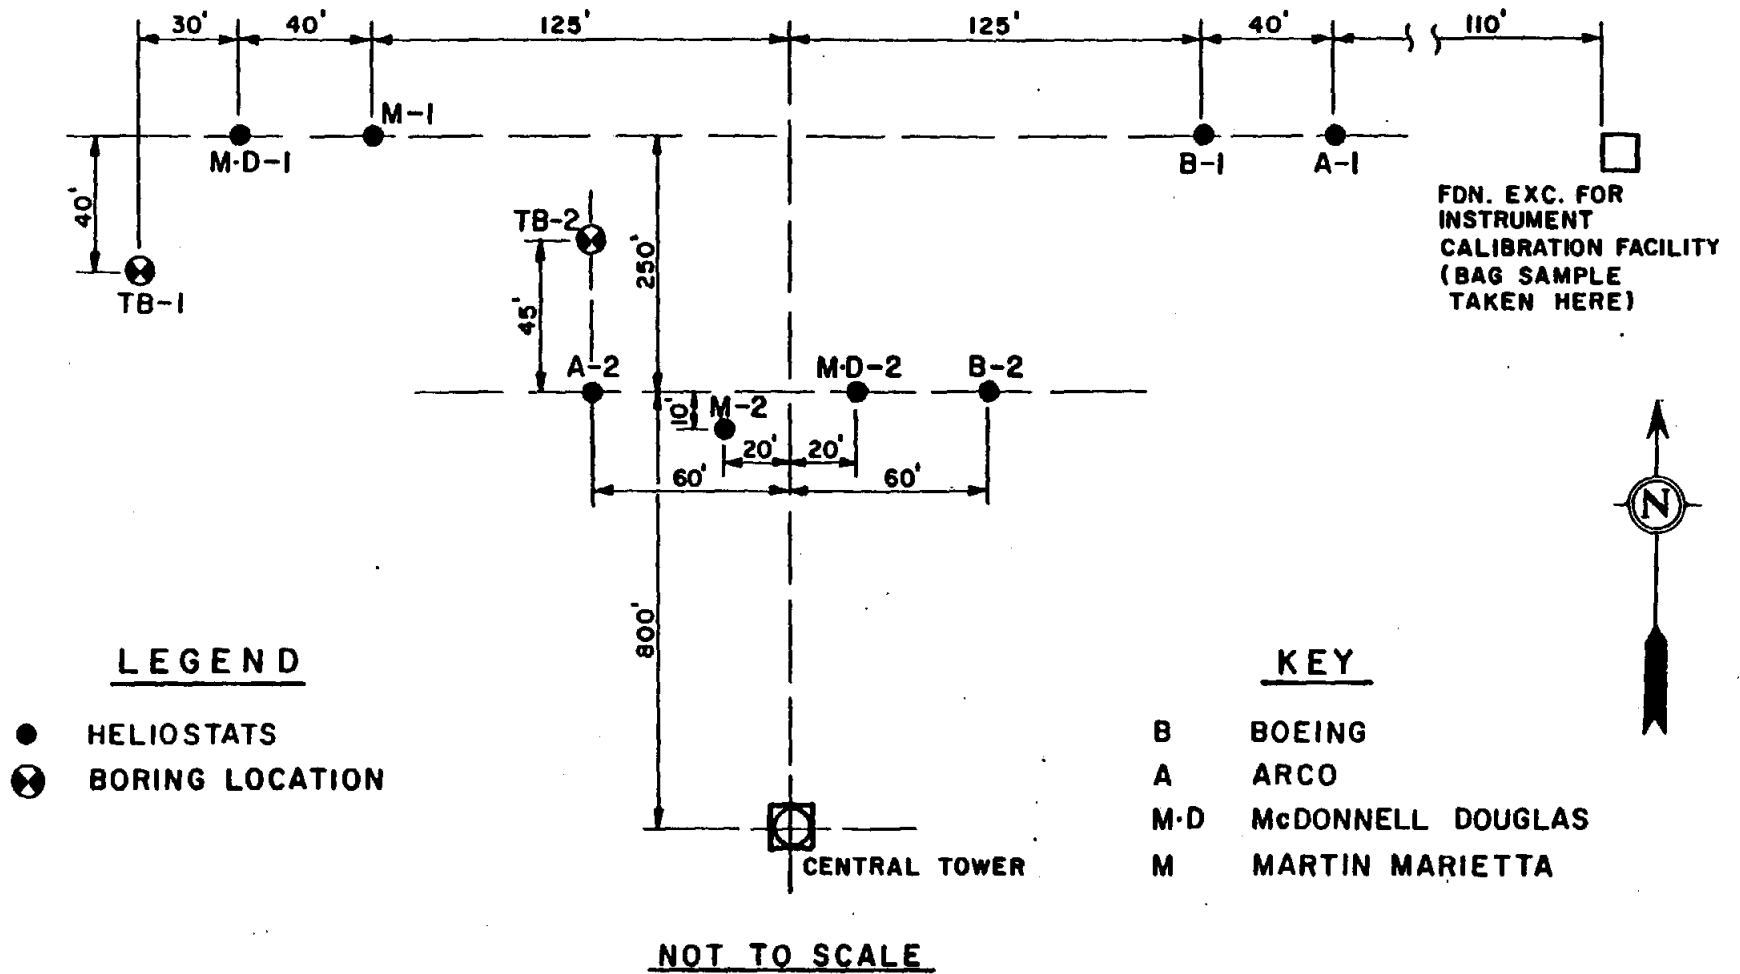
PLAN AND LOCATION OF TEST BORINGS AND HELIOSTATS, SANDIA'S CENTRAL RECEIVER TEST FACILITY
